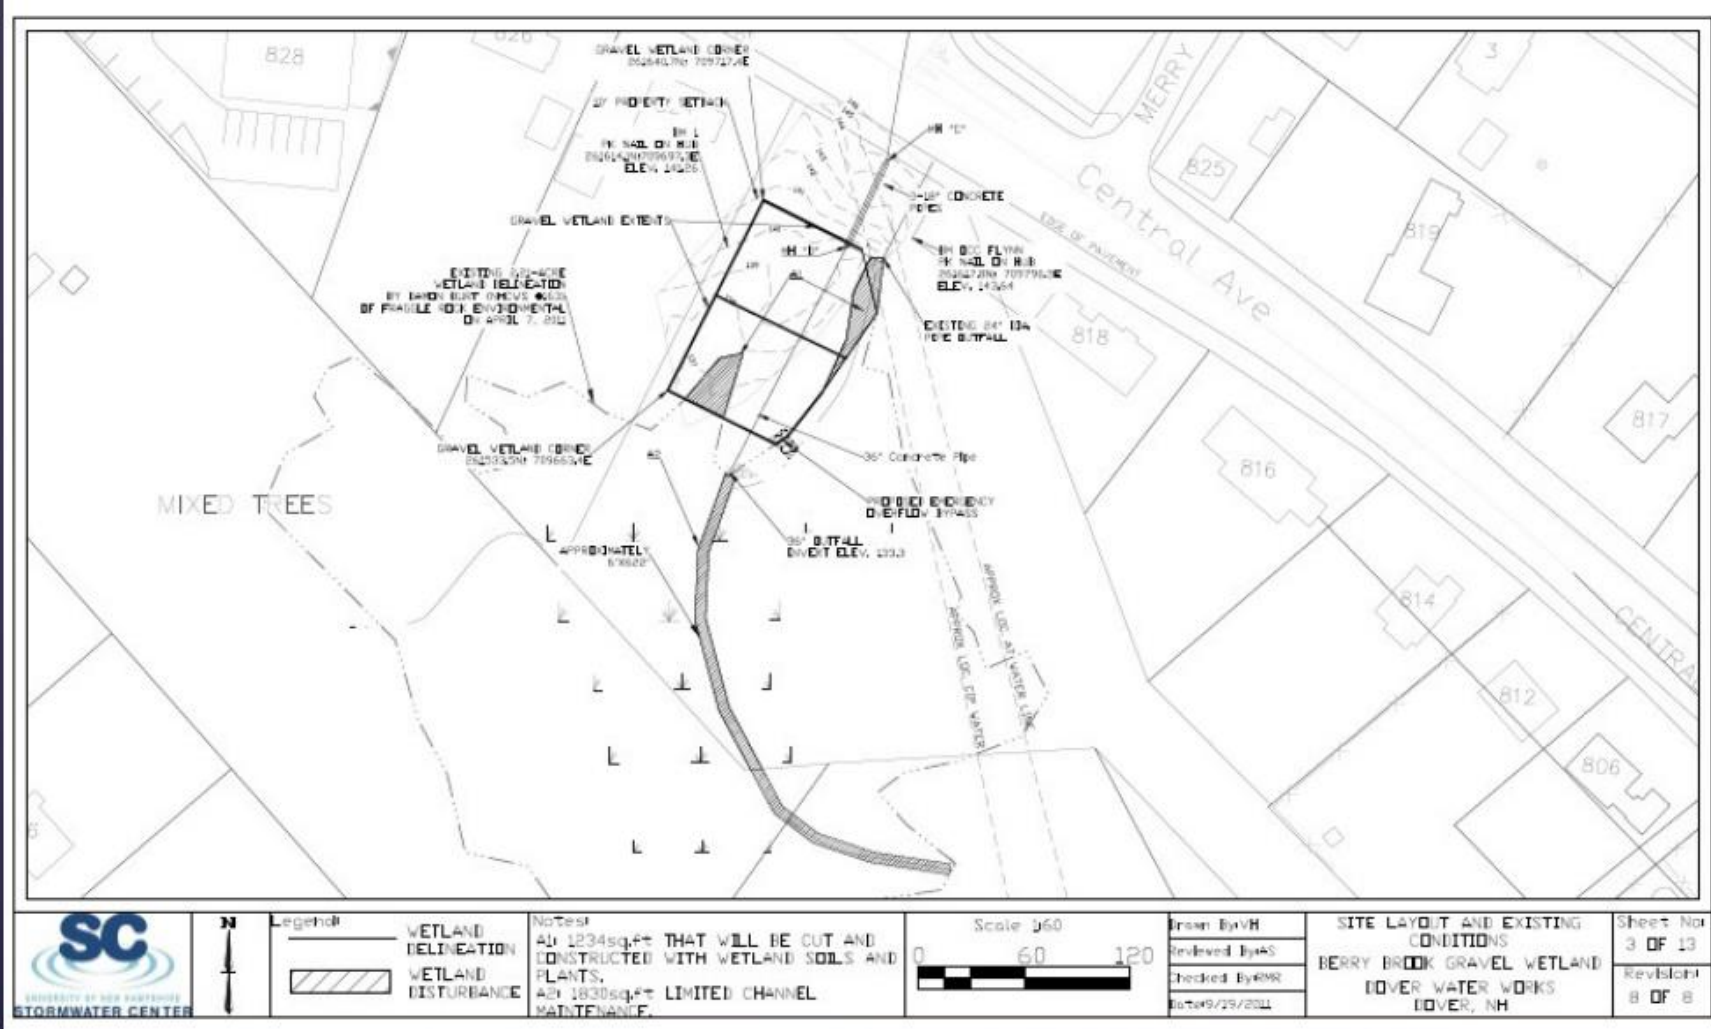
Central Avenue Gravel Wetland site layout and existing conditions
